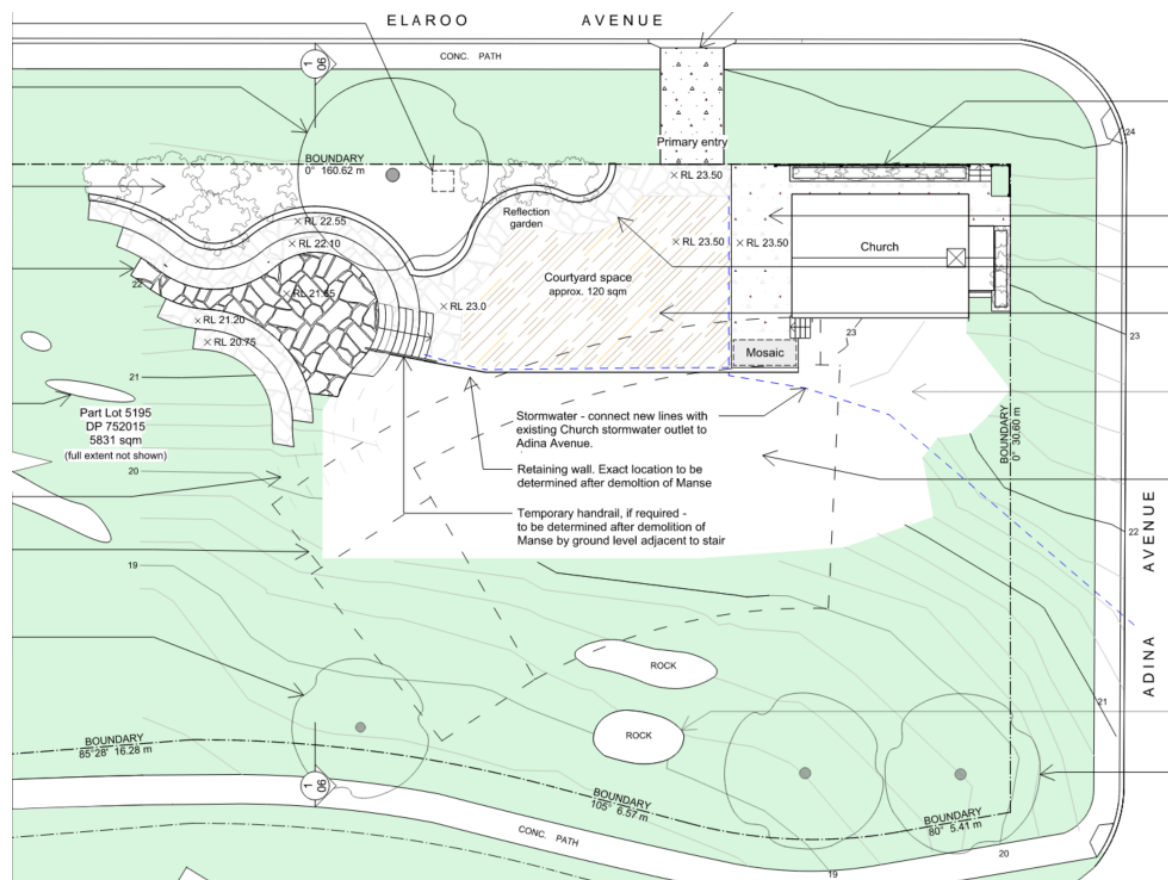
Proposed Site Plan – Source Drawing No. DA05.
